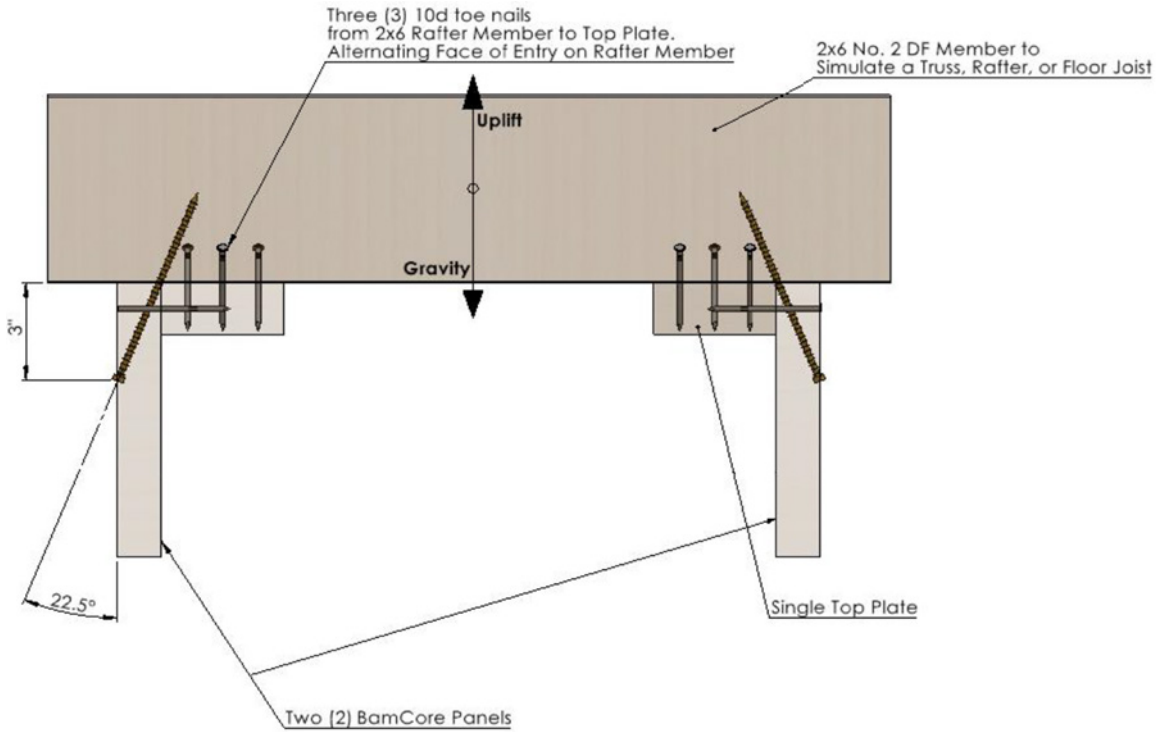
Top Plate of BamCore Prime Wall System and Truss/Rafter/Joist
